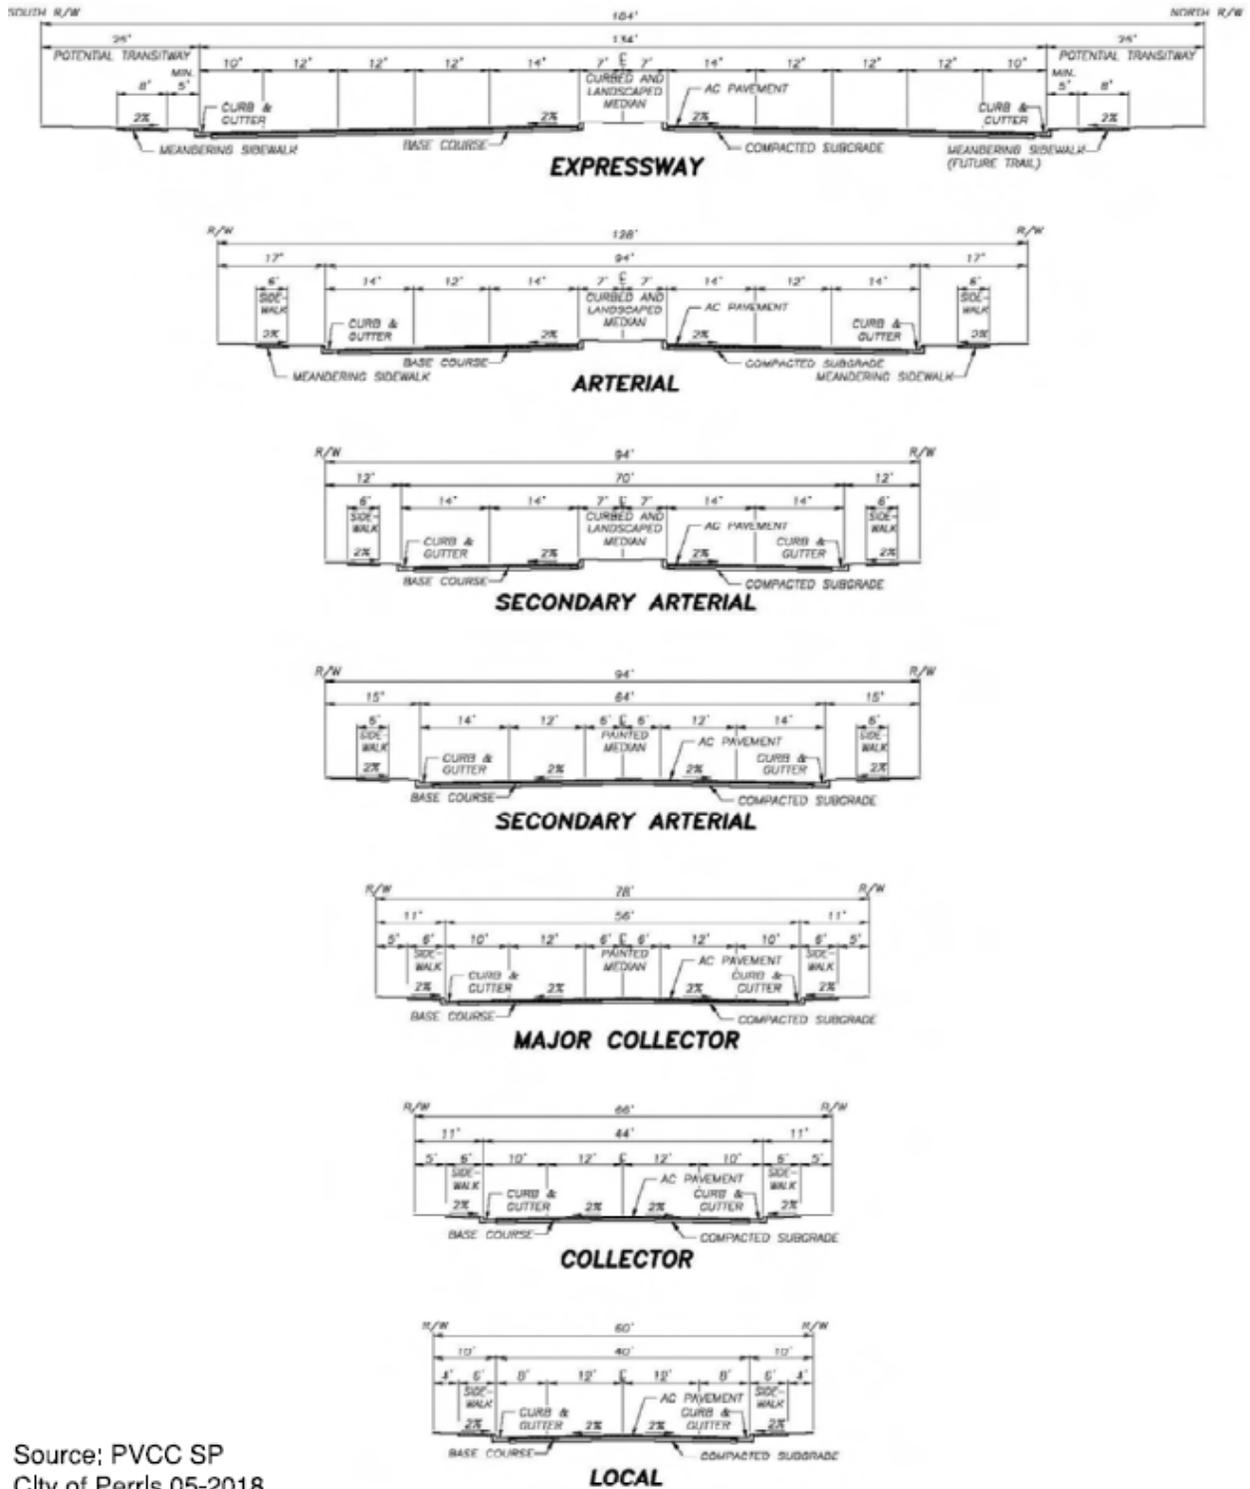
PERRIS VALLEY COMMERCE CENTER SPECIFIC PLAN CROSS-SECTIONS
